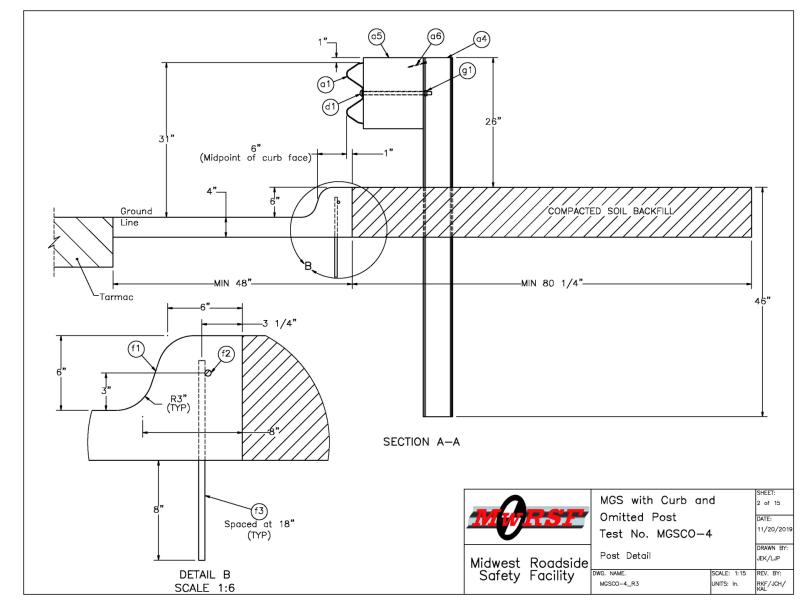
System Profile, Curb Geometry, and Reinforcement Details, Test No. MGSCO-4
